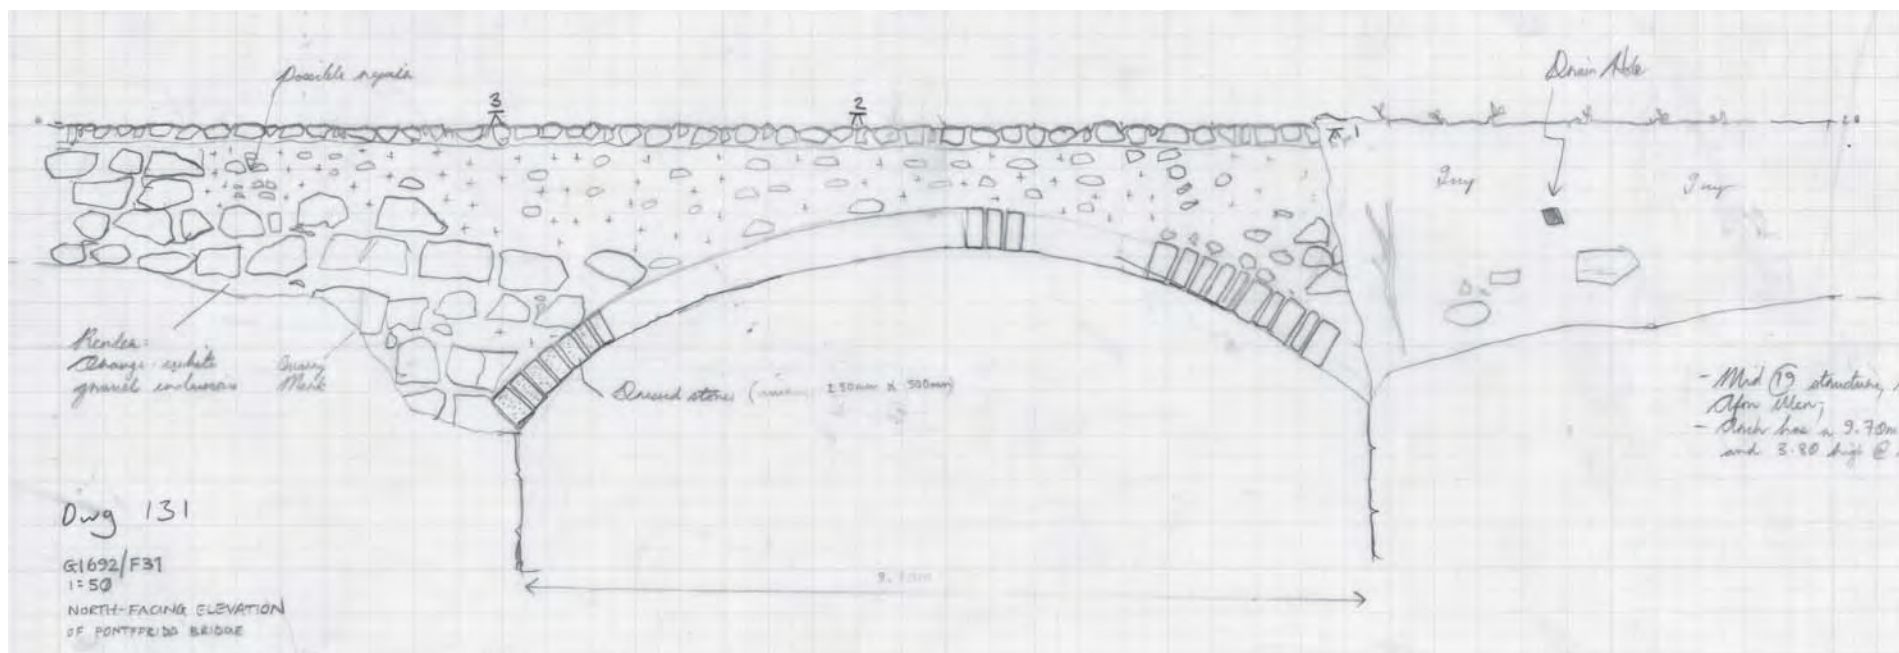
North facing elevation of Pontffridd Bridge (Feature 31)
